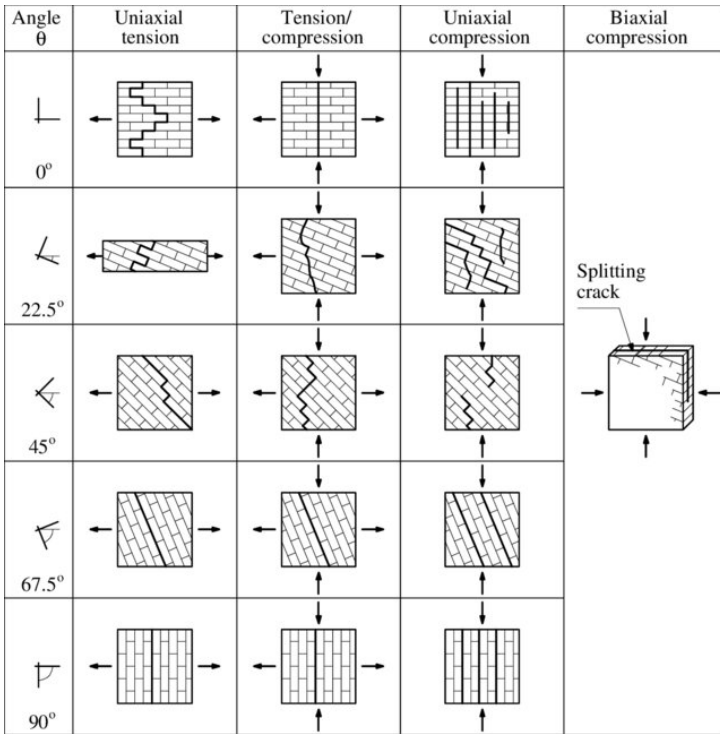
Modes of failure of masonry wallets subjected to biaxial tests, taken from [62].
